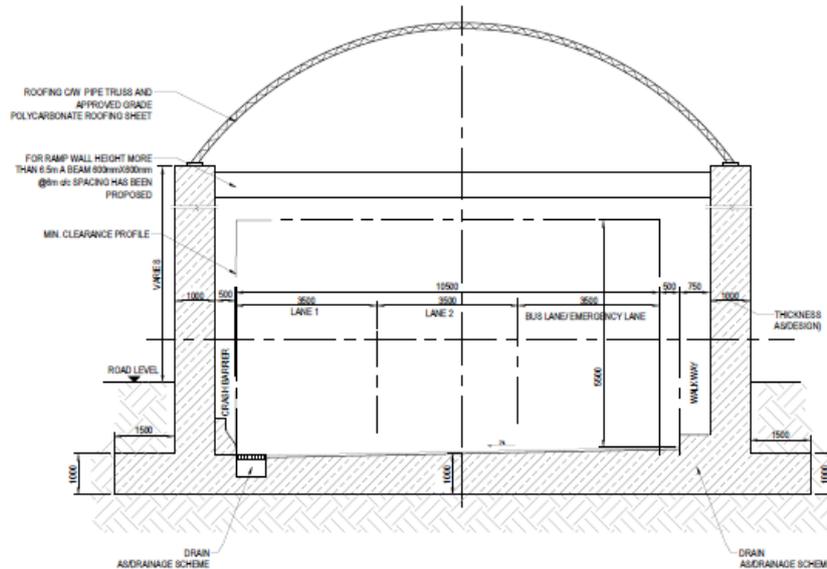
Typical Cross Section RAMP Structure (3 LANE)
